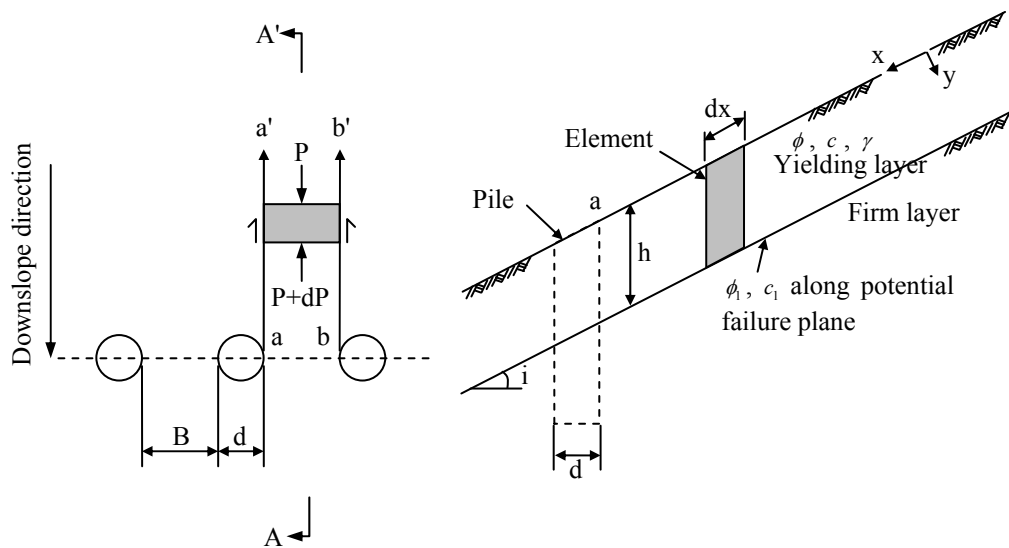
Idealised pile-slope system (after Wang and Yen, 1974)
